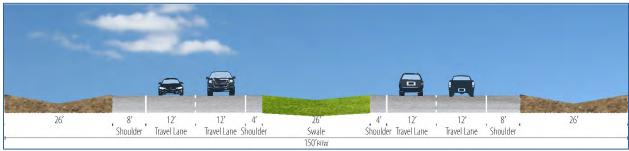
Typical Cross Section Between 3000 West and West Davis Corridor
